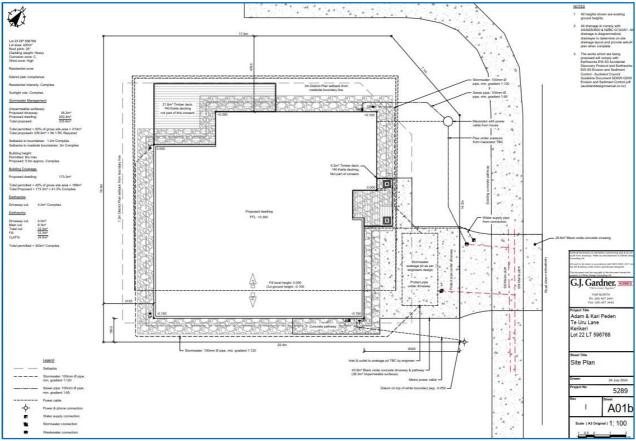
Site Plan (Source: G.J. Gardner Homes)
